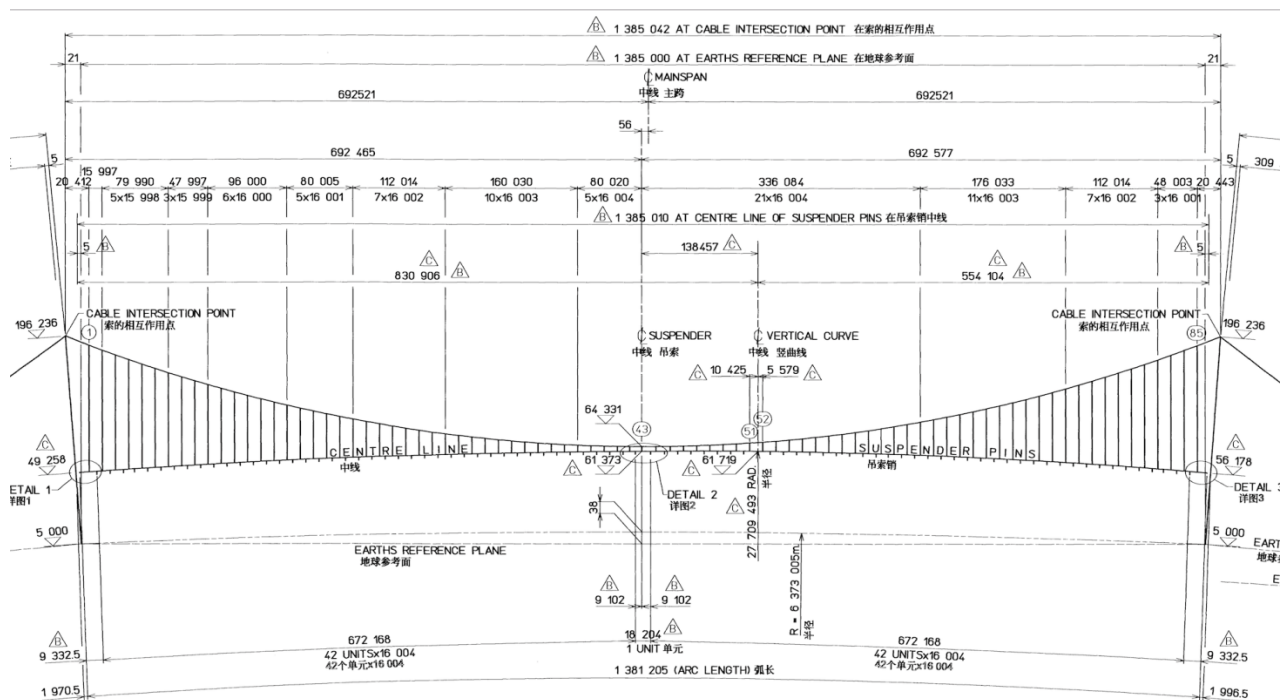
Elevation of Jiangyin Yangtze River Bridge
